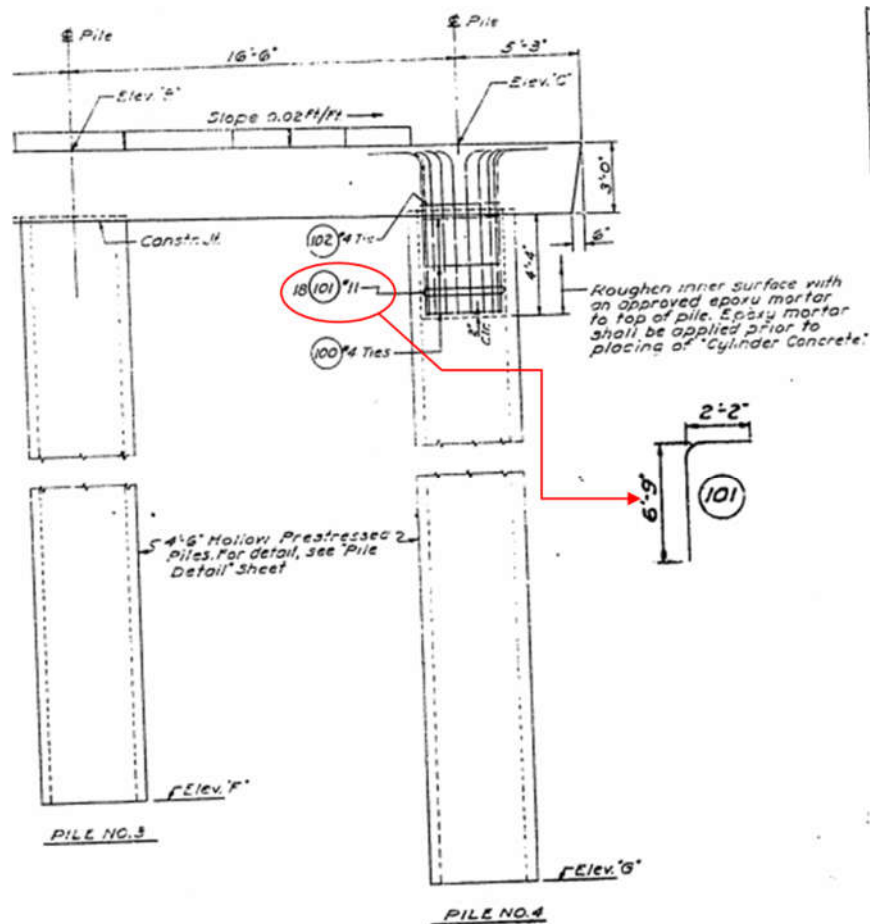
Plug Reinforcement Details for Le Line Slide Bridge
